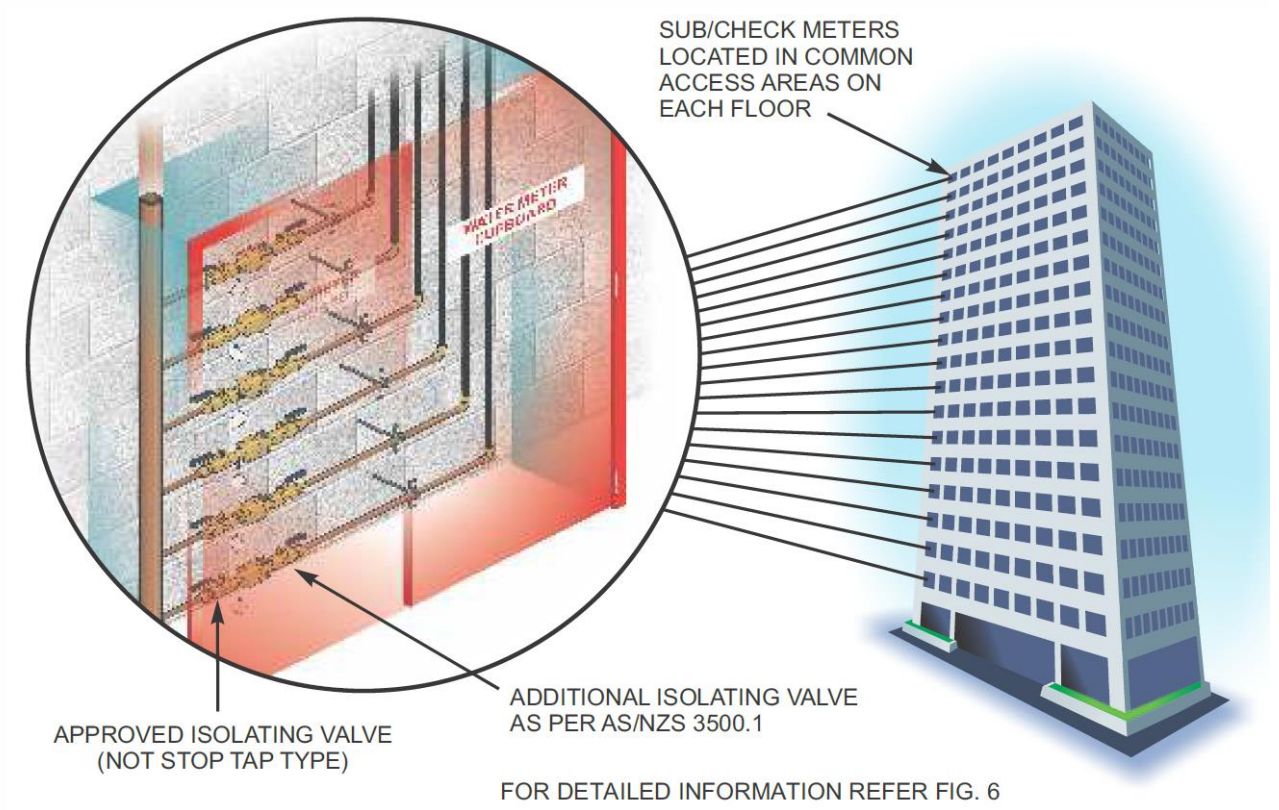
High Rise Sub/Check Meter Typical Arrangement
